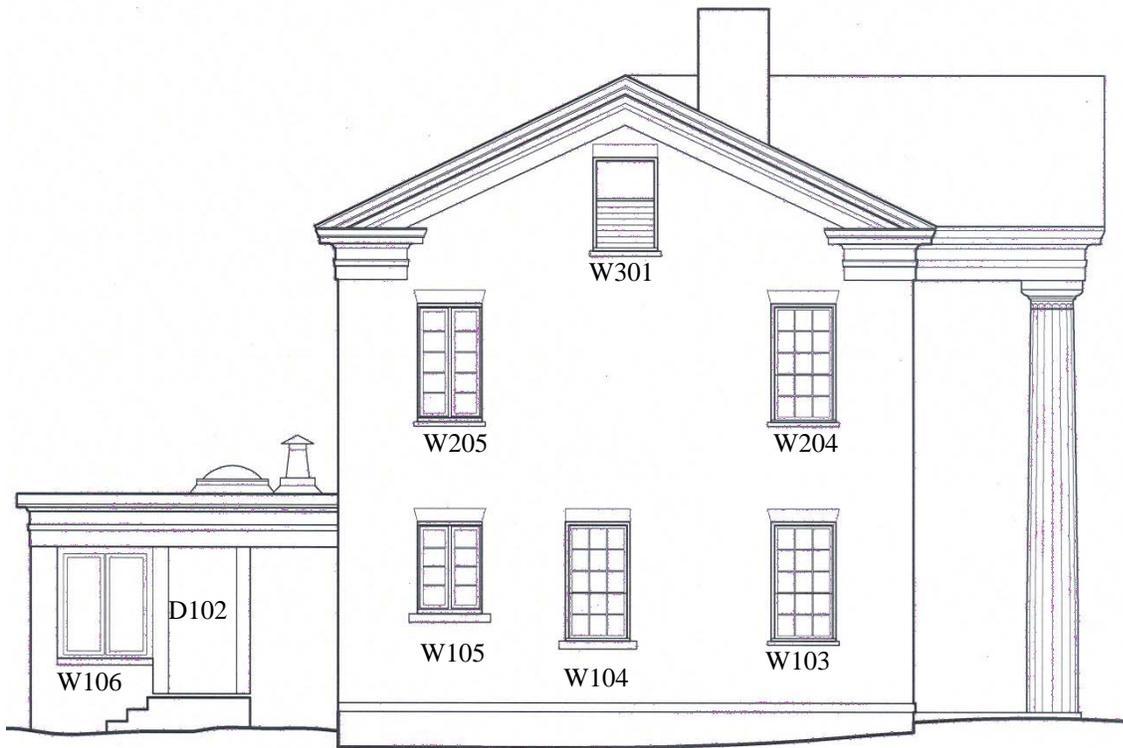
West elevation of the Hunt House, December 2006. Not to scale.
